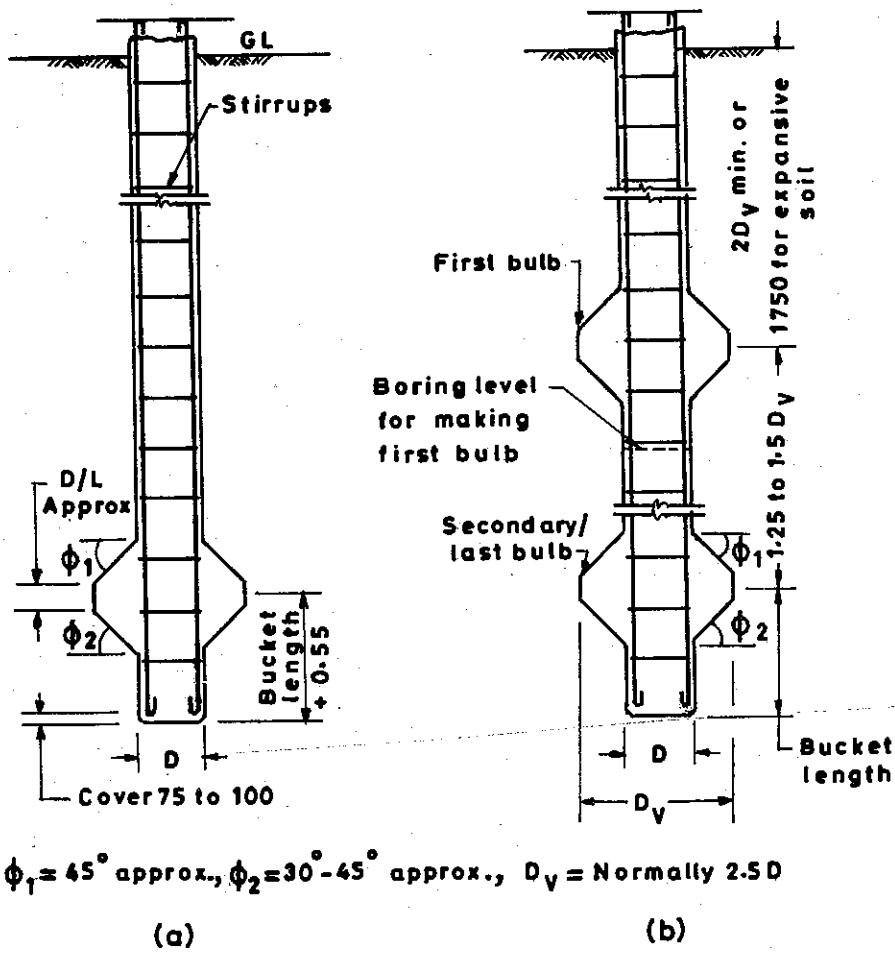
Typical details of bored cast *in situ* under-reamed pile foundations: (a) Section of single under-reamed, (b) Section of multi under-reamed.
